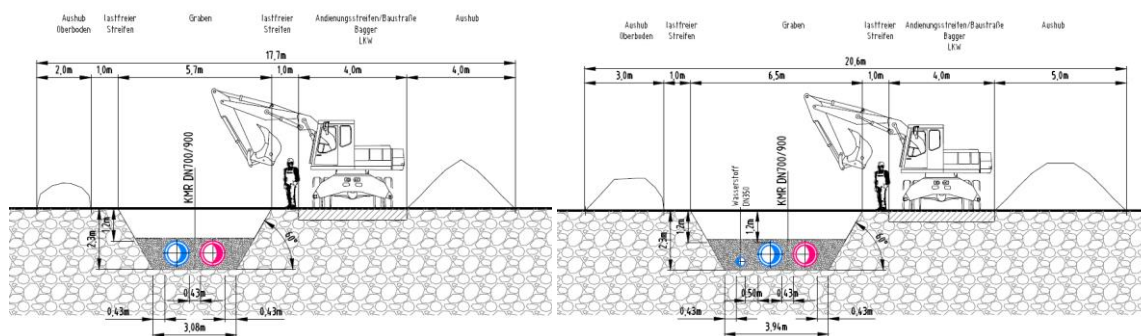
Possible trench profiles with & without hydrogen line/GEF Ingenieure
